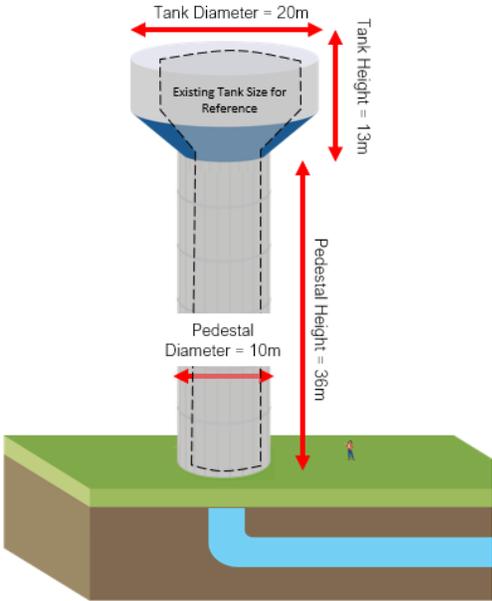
Alternative 2: New Elevated Tank to Replace Existing Tank
